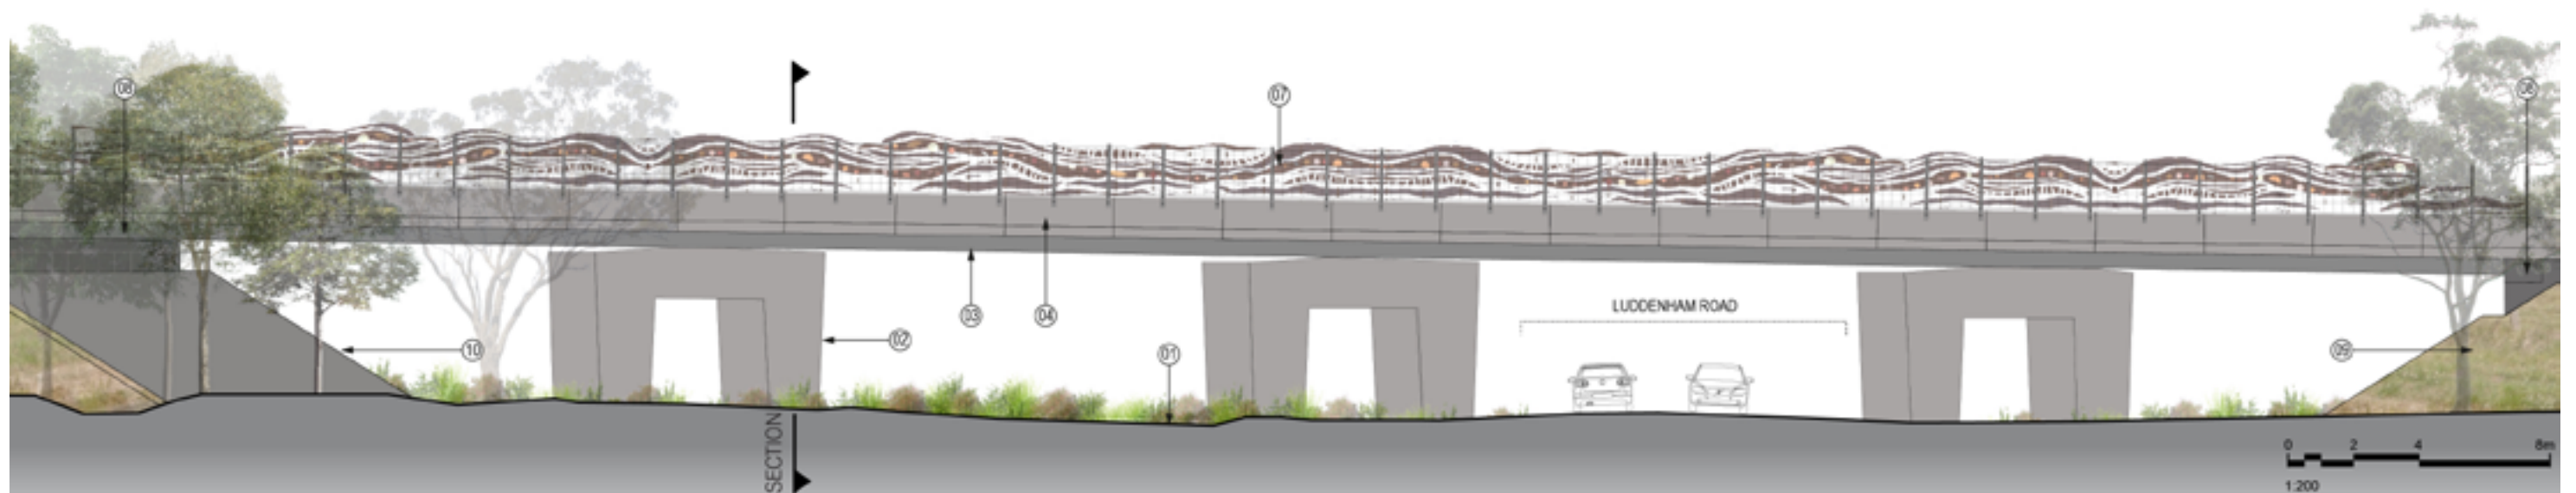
Elevation - BR01 - Bridge over Luddenham Road
